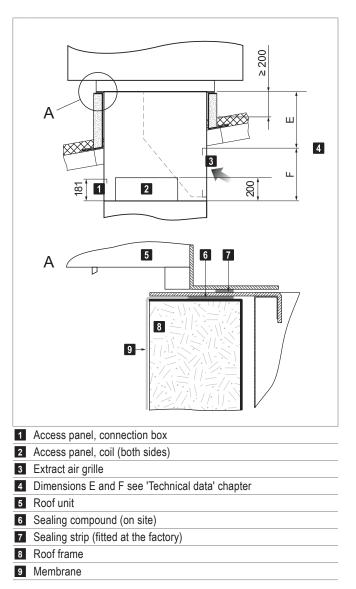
Installation of RoofVent® units in the roof frame (dimensions in mm)
